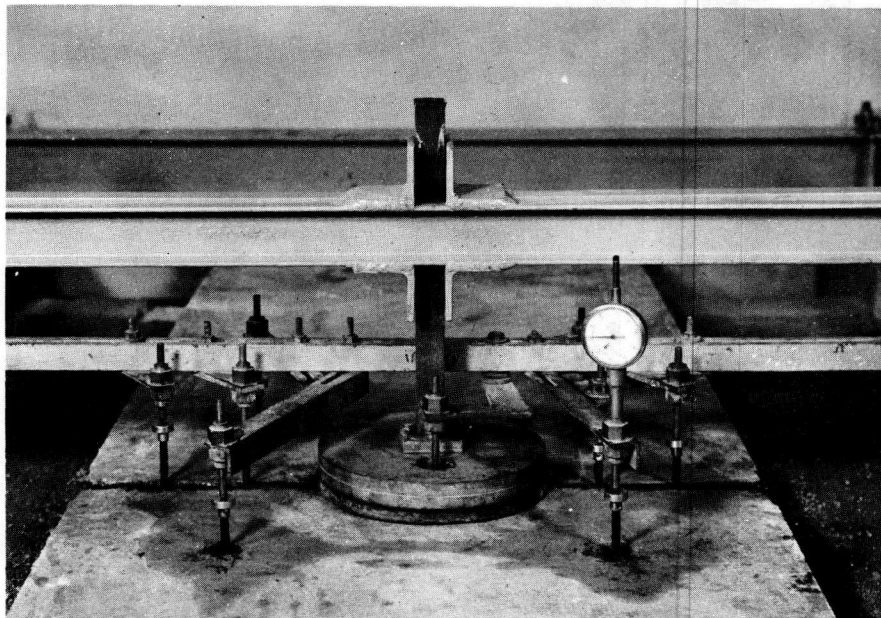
Load plate in position over the joint in the concrete slab. Reference rods and dial gage for obtaining deflection and densification data may be seen.
